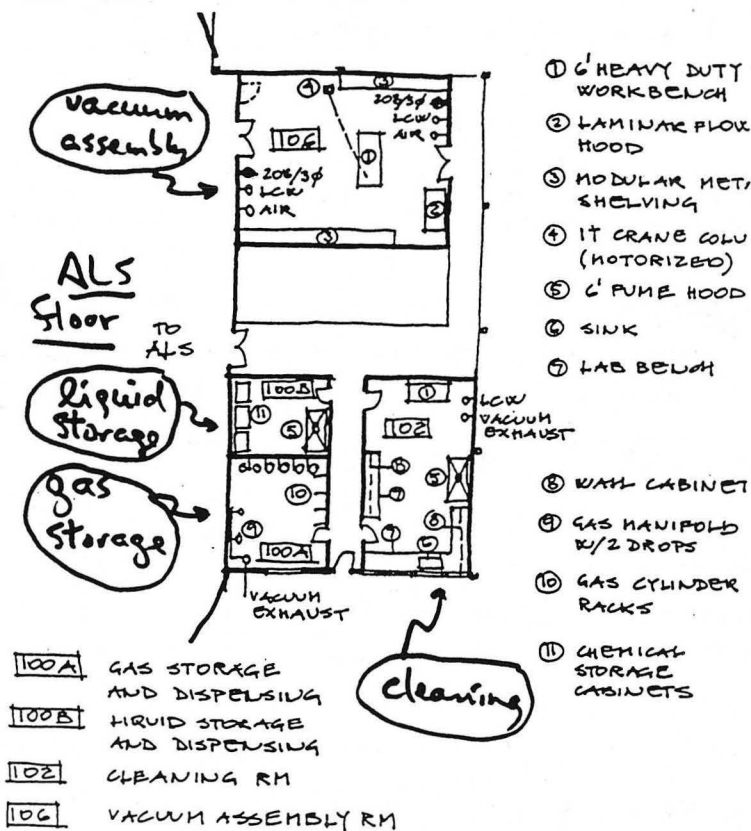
Space in Building 10 is now being refurbished for user facilities.
